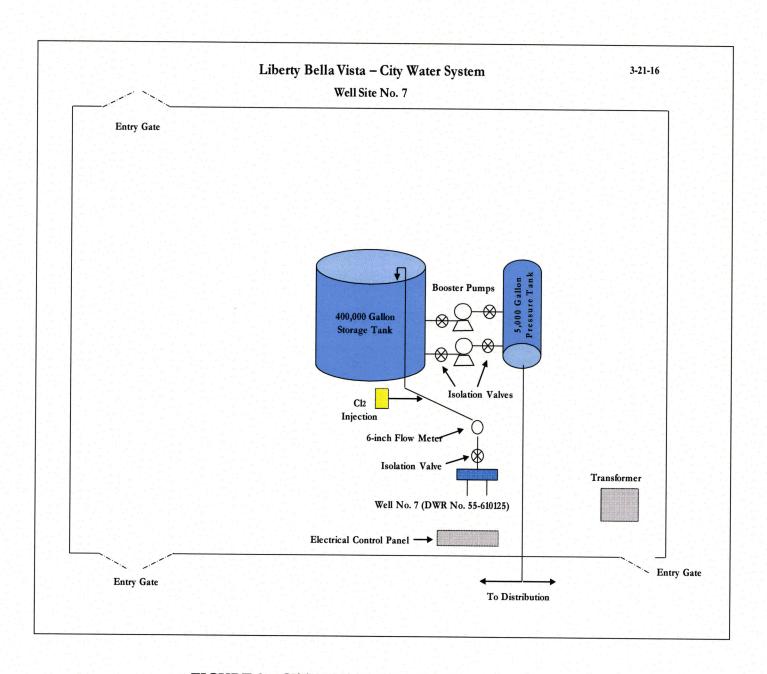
CITY WATER SYSTEM WELL SITE NO. 7
